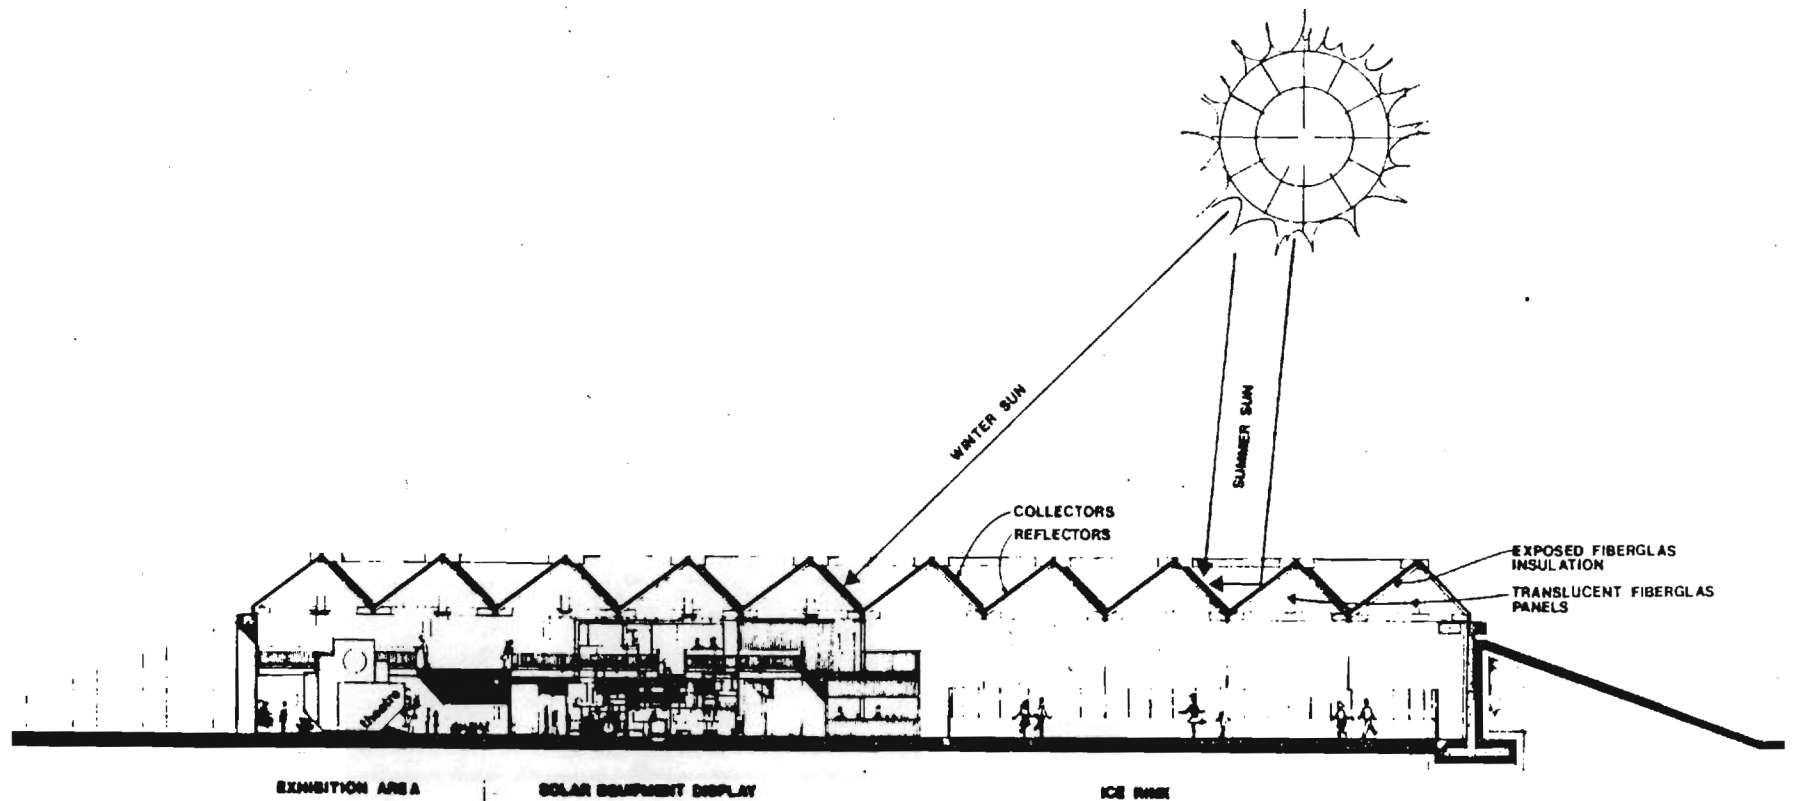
Architectural Cross Section of Building Showing Integrated Collector/Reflector System.
